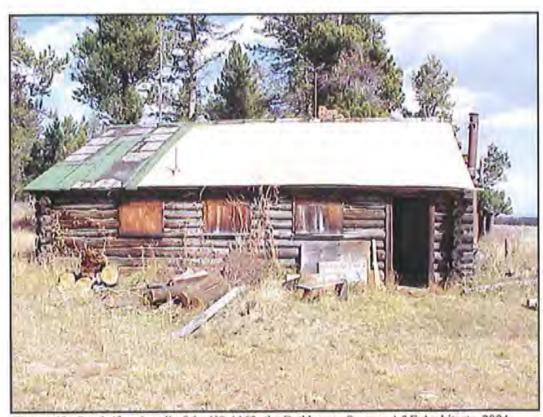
South (front) wall of the HS-1162, the Bathhouse. Source: A&E Architects, 2004.
